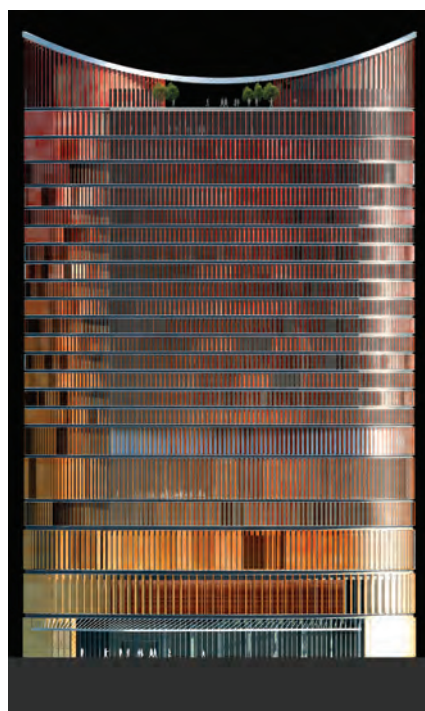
Four Seasons, Delhi: North elevation. (Source: Woods Bagot)
